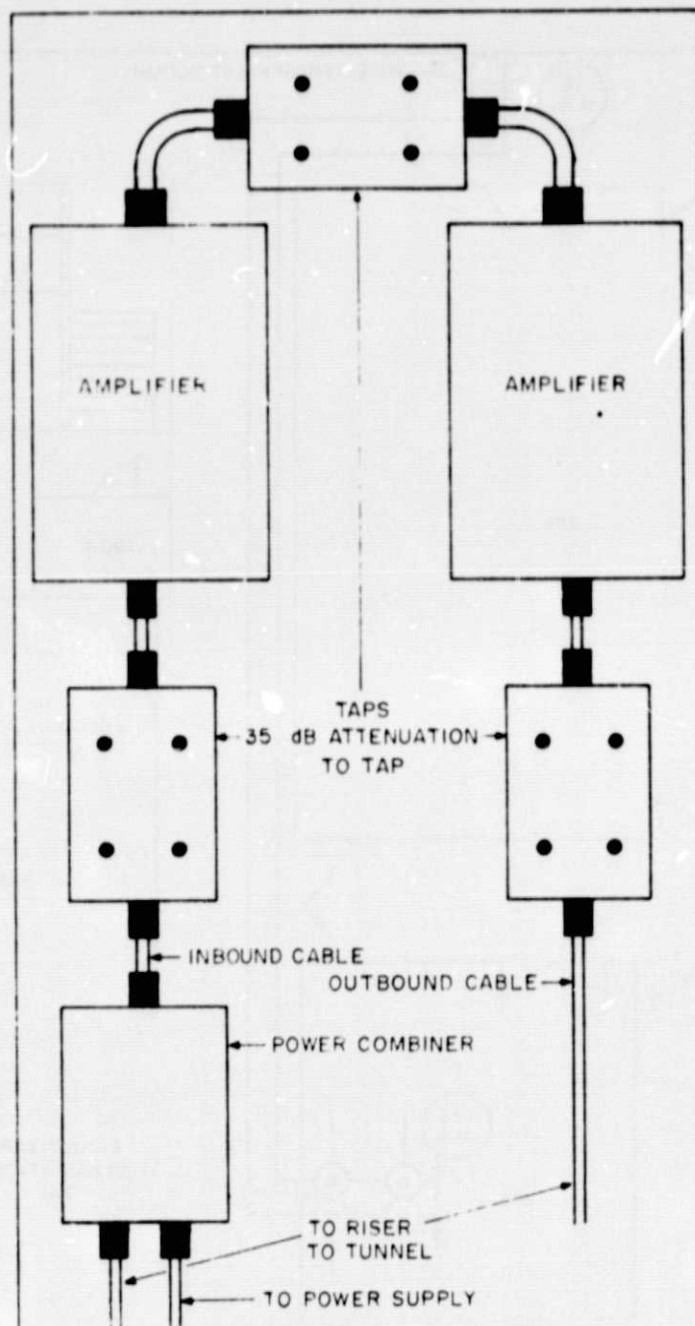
Detail 1: Equipment Mounting in Headend (Building 4)
